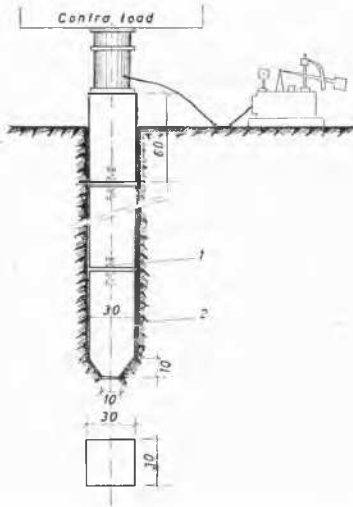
Penetration of Mega pile. 1, wedge; 2, pile element. Enfoncement d'un pieu « Mega ». 1, cale; 2, élément du pieu.
